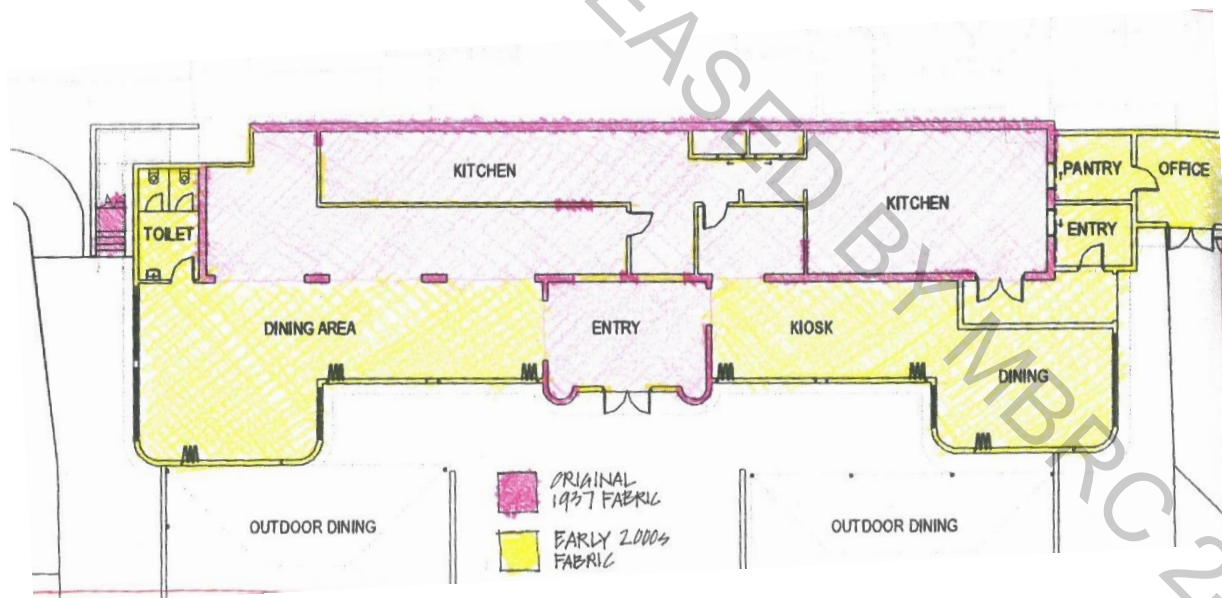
Diagrammatic upper floor plan showing extent of original fabric
